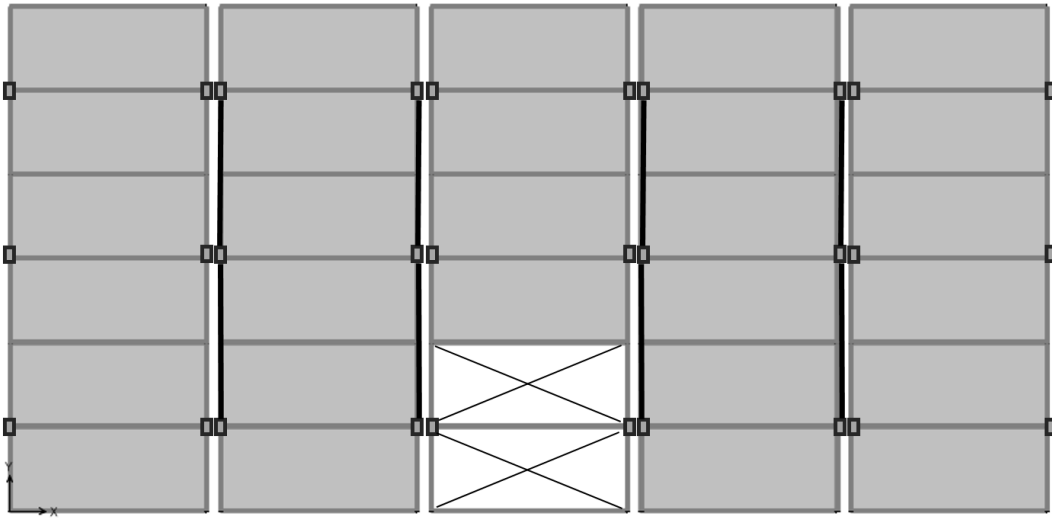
1. A plan view of a typical floor of the ten storey modular building considered for the analysis
